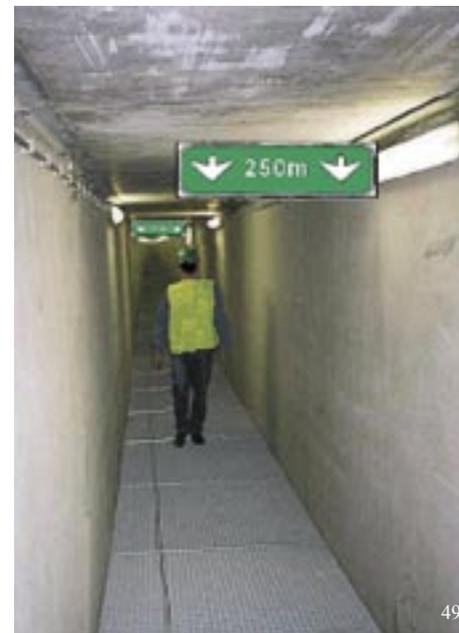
Panel mounted on the ceiling of escape galleries between tunnel tubes to indicate direction and distance to the open area
